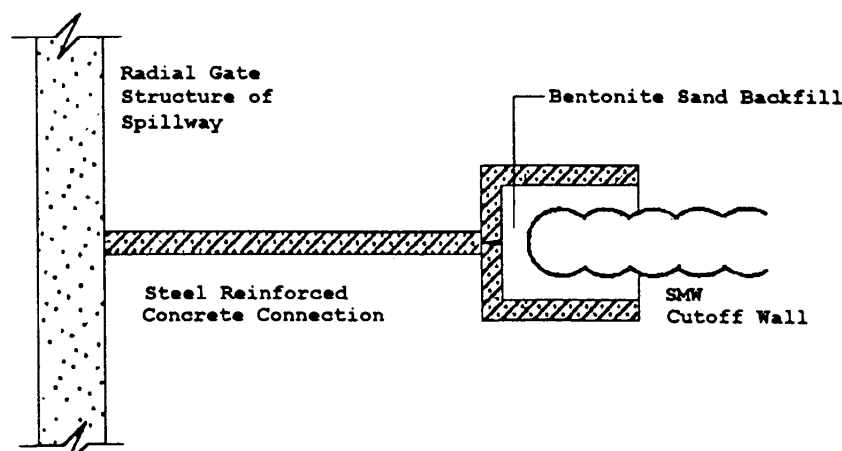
Lake Cushman spillway: Connection between soil cement wall and spillway wall (Yang & Takeshima, 1994)
